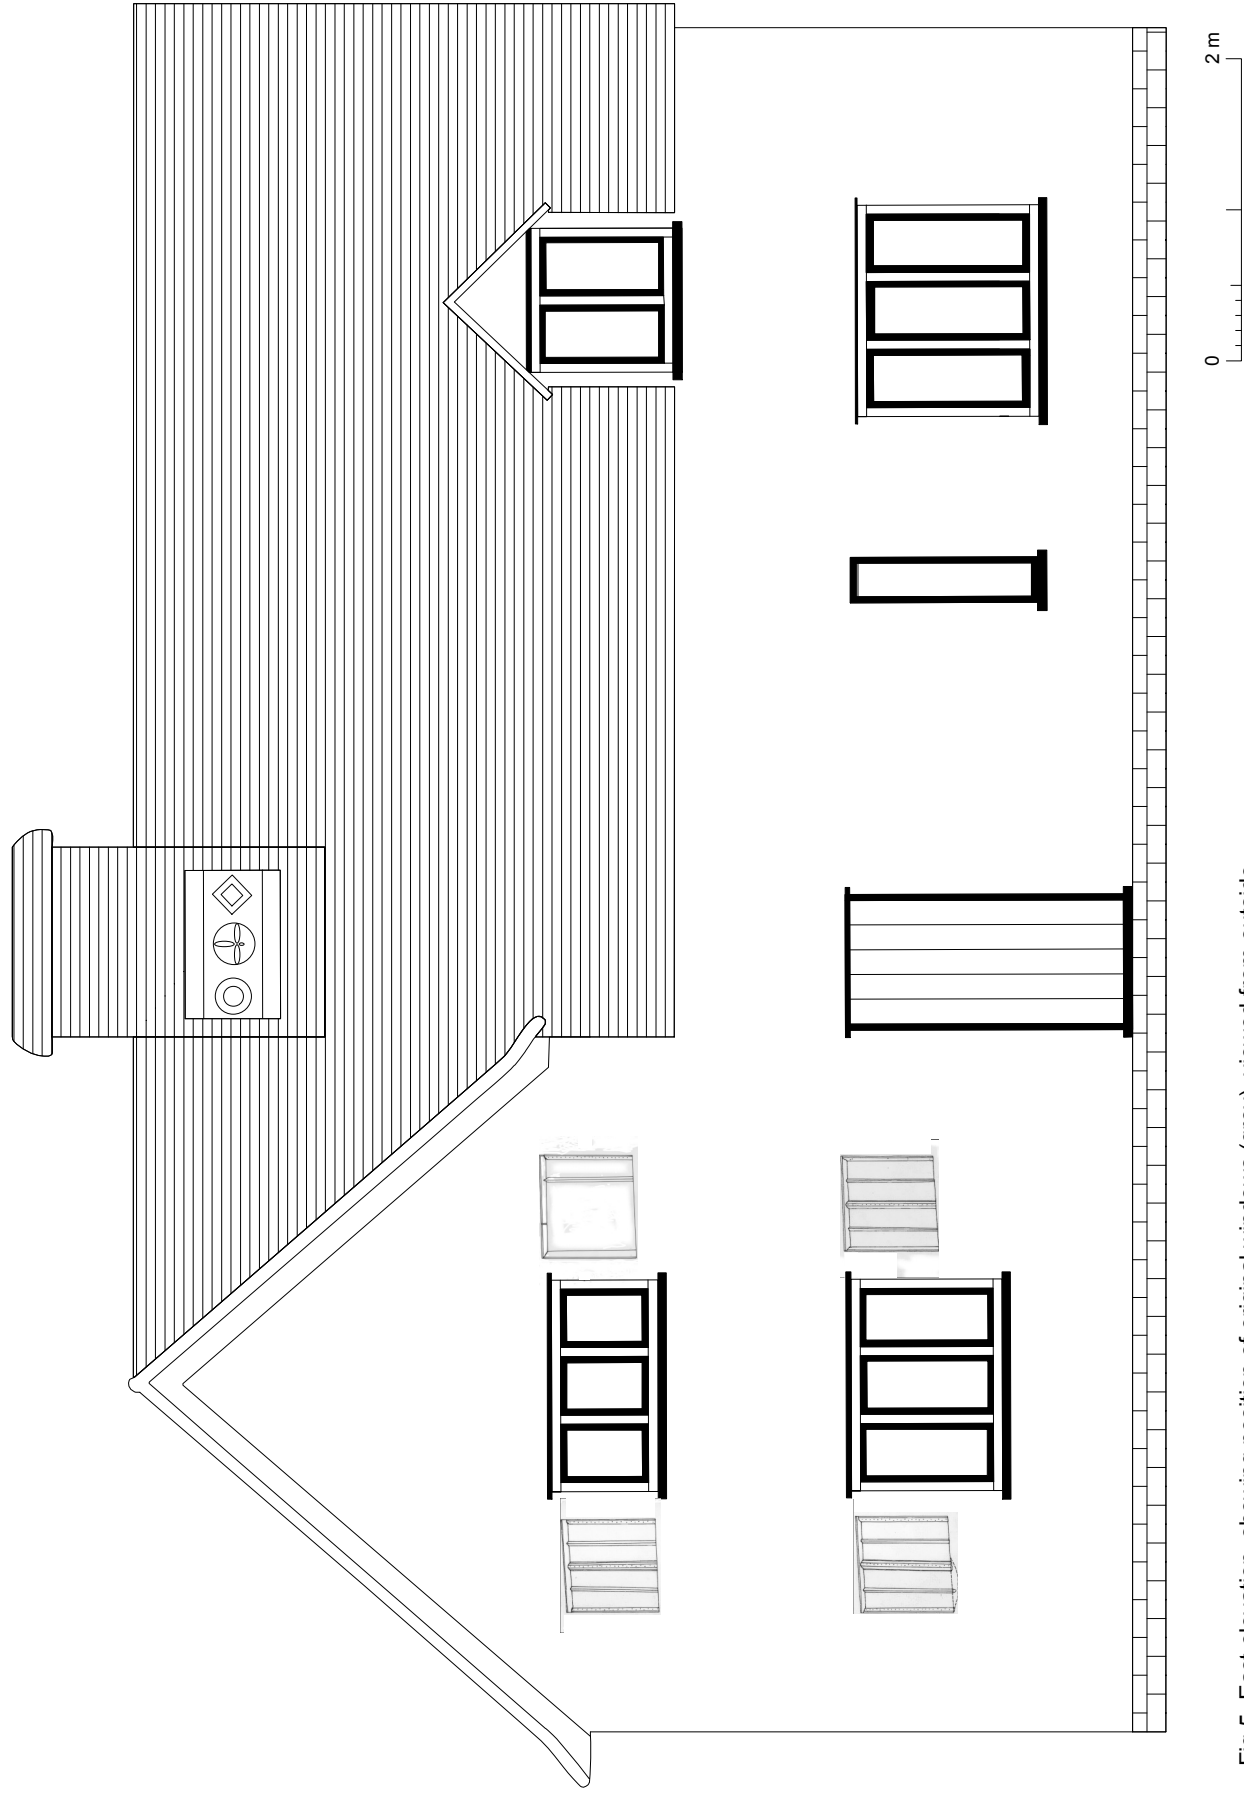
East elevation, showing position of original windows (grey), viewed from outside.
